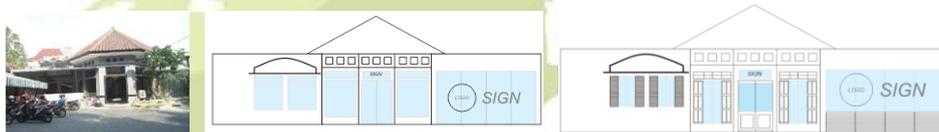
From left: Visualisation of original building, Calais facade recommendation
